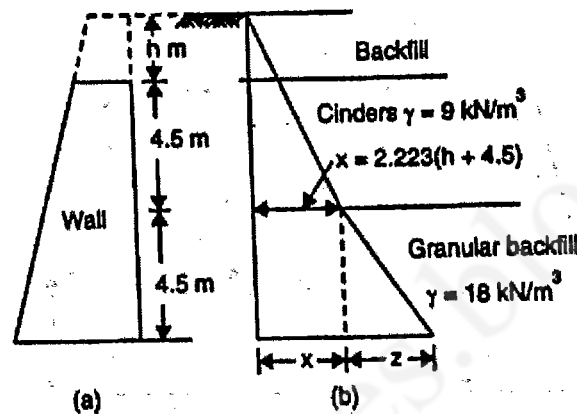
Retaining wall with backfill partly of cinders (Ex. 13.14)
